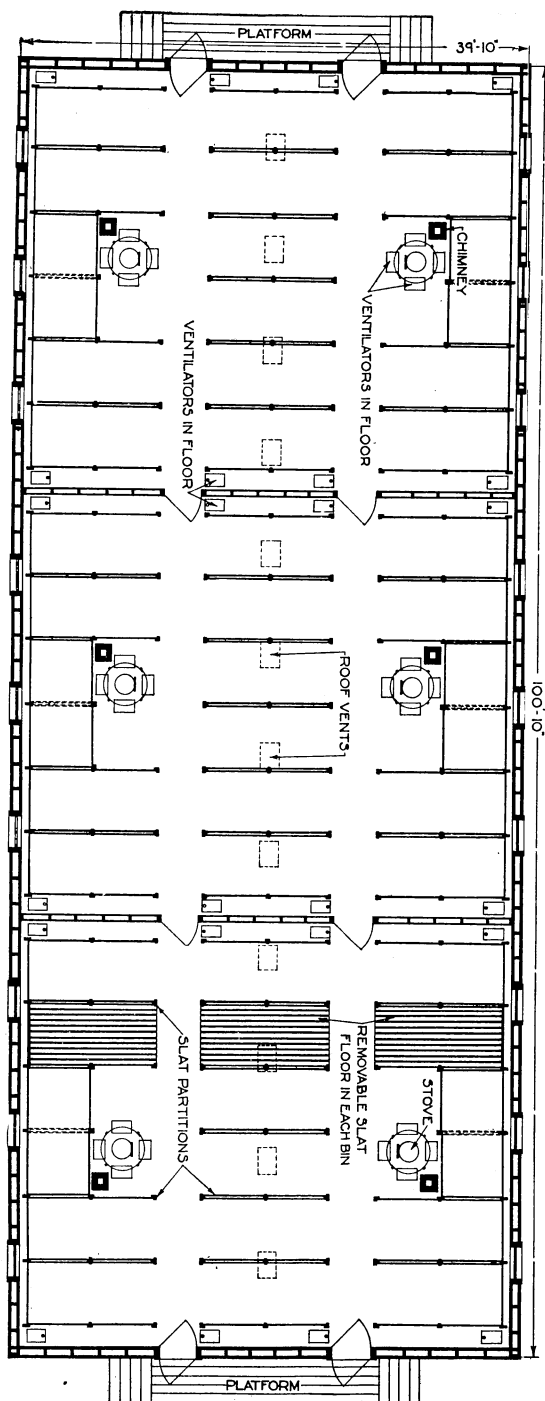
Floor plan of a sweetpotato storage house, size 39 feet 10 inches by 100 feet 10 inches, having a capacity of 12,000 bushels in crates or 15,000 bushels in bulk.
